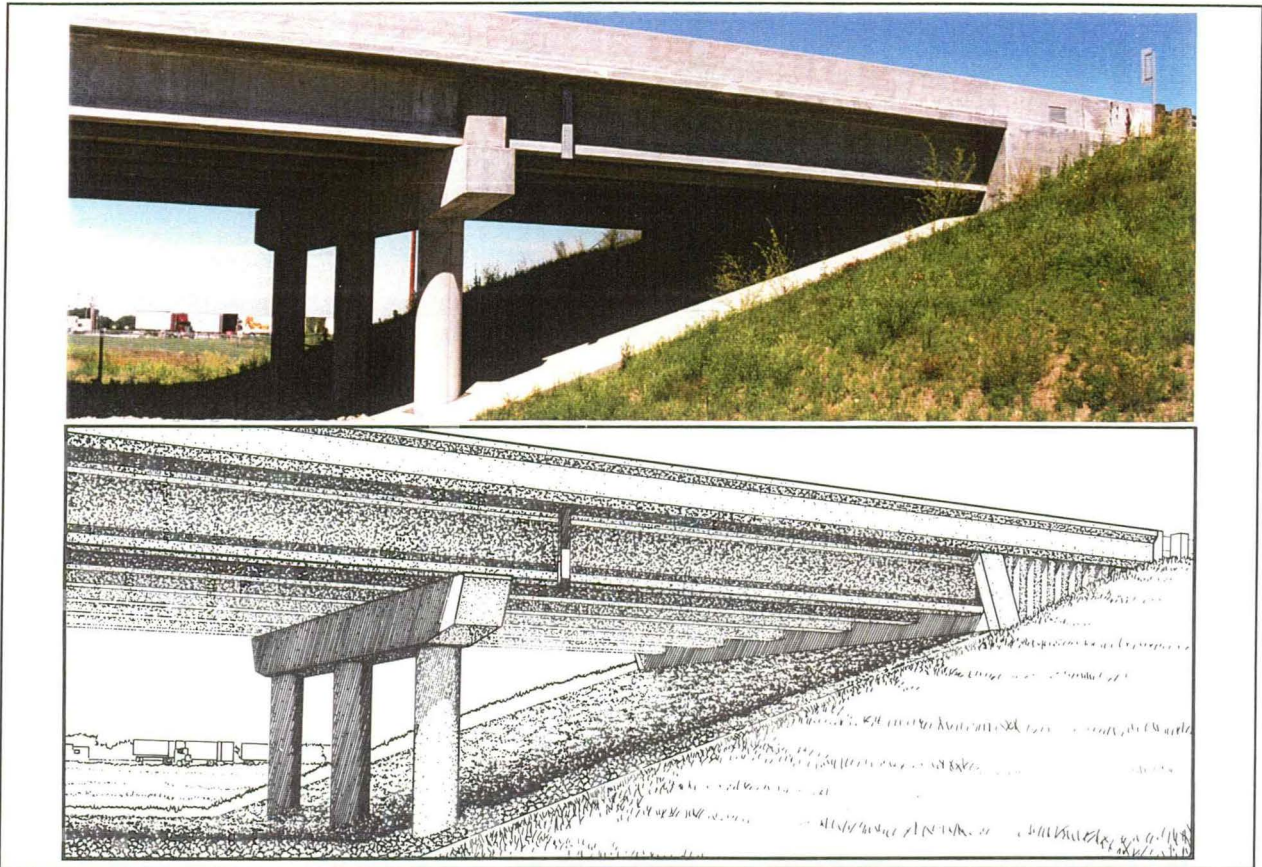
Existing and Proposed Views - Barrier Rail, Slab Edge, Pier Cap, and Abutment Modifications Shown
